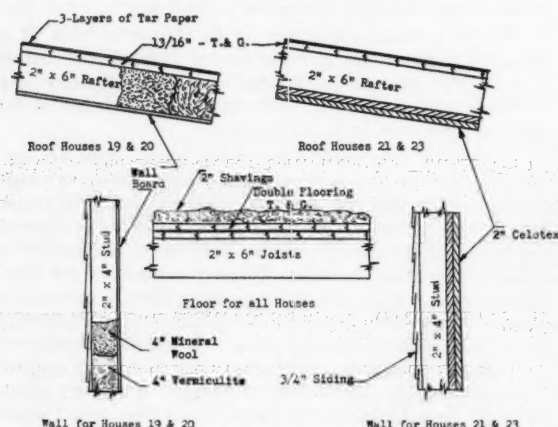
CROSS SECTION OF THE WALLS, FLOORS, AND CEILINGS IN THE FOUR EXPERIMENTAL BROODER HOUSES. (THE BUILT-UP ROOF IS MADE OF SLATER'S FELT AND HOT ASPHALT)
